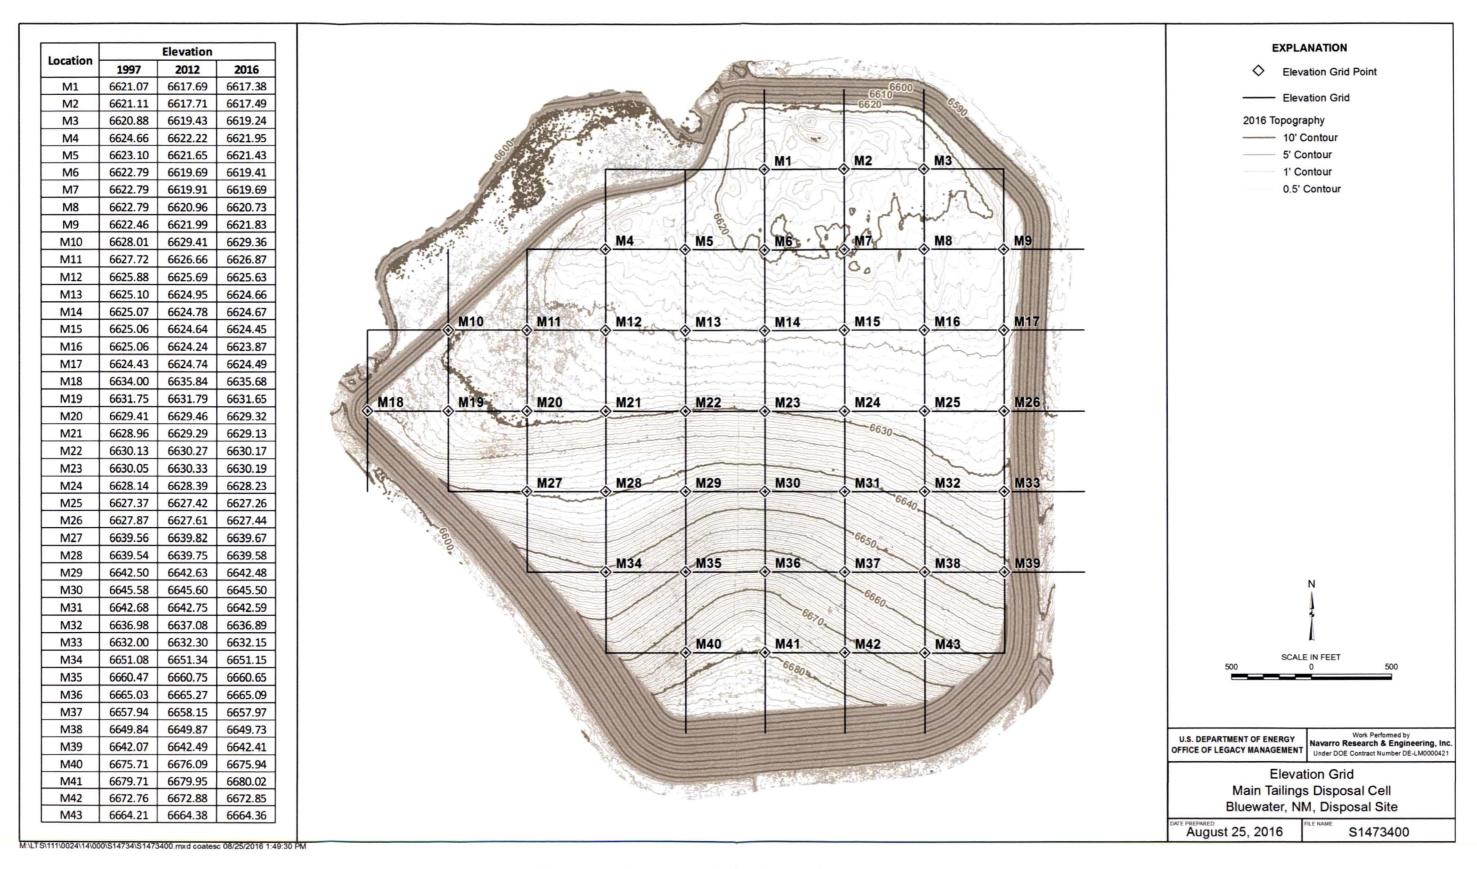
500-Foot Elevation Grid on the Main Tailings Disposal Cell
